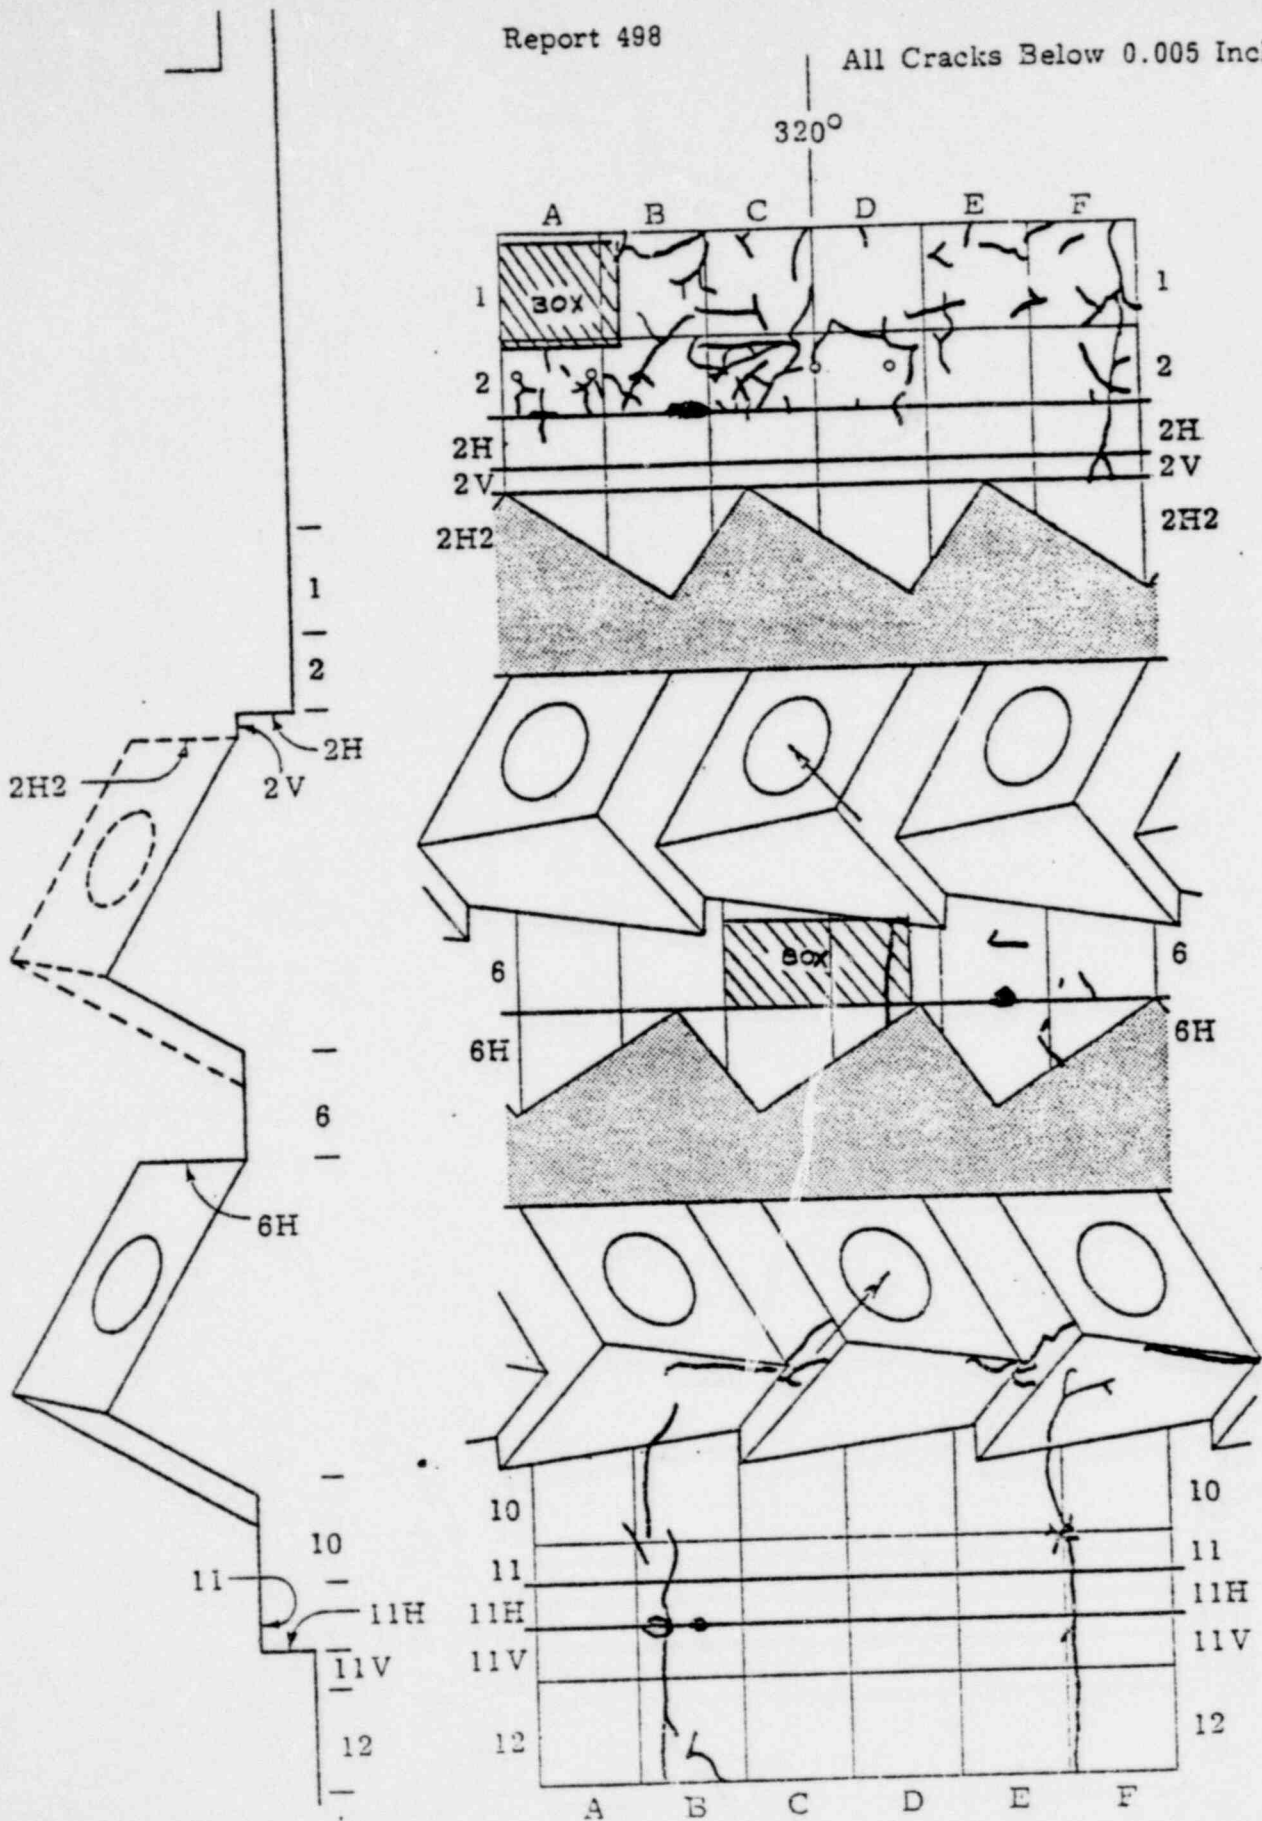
CRACK PATTERN AT AZIMUTH 320° AFTER FULL PRESTRESS, SEPTEMBER 18, 1973.
